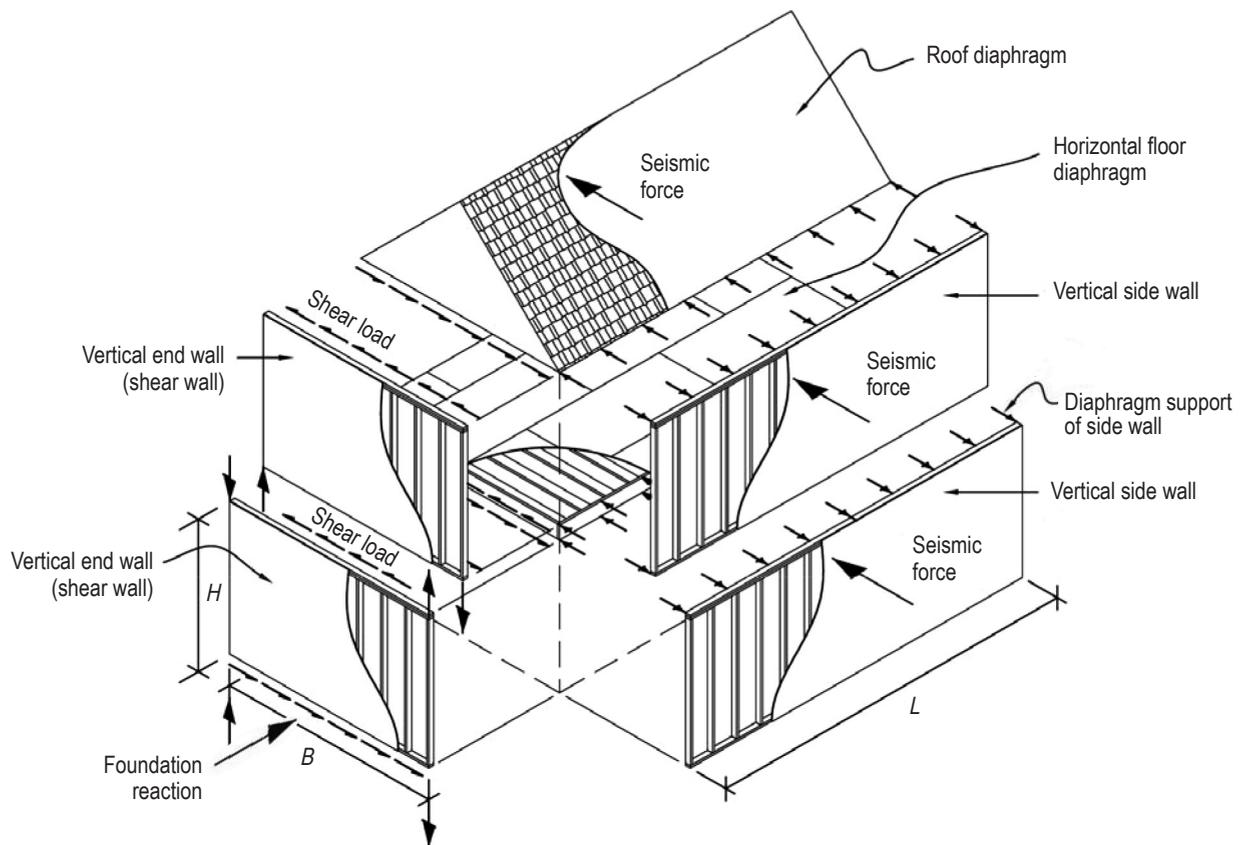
Wood light-frame building with load path illustrated (FEMA 2006).
